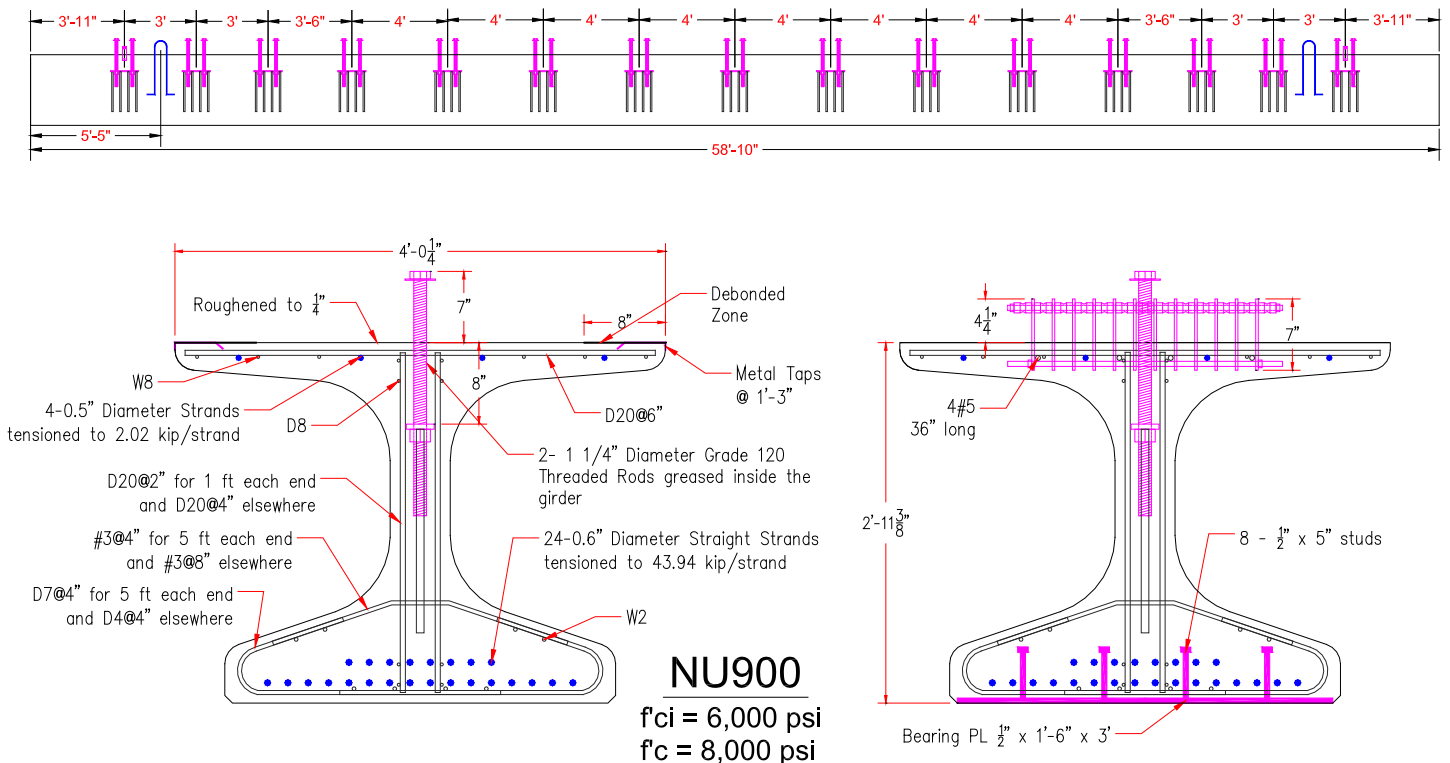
Elevation view, middle cross section (left), and end cross section (right) of NU900 girder specimen
